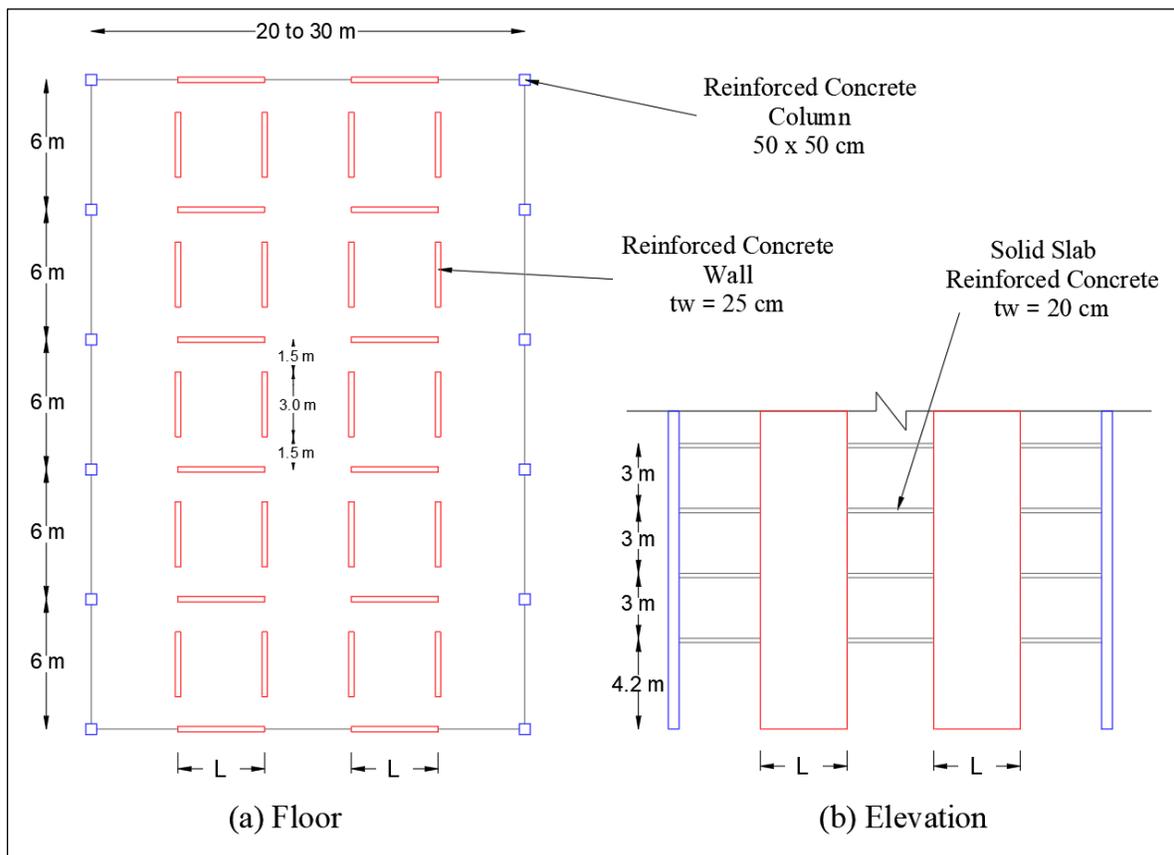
(a) Plan and (b) elevation of the reinforced concrete building.
